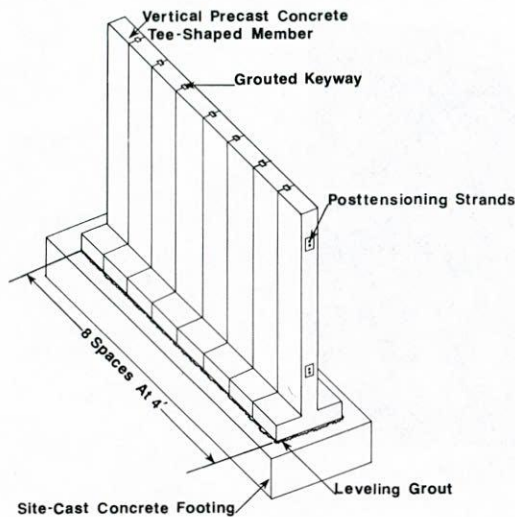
Abutment With Precast Concrete Vertical Tee-Shaped Members
